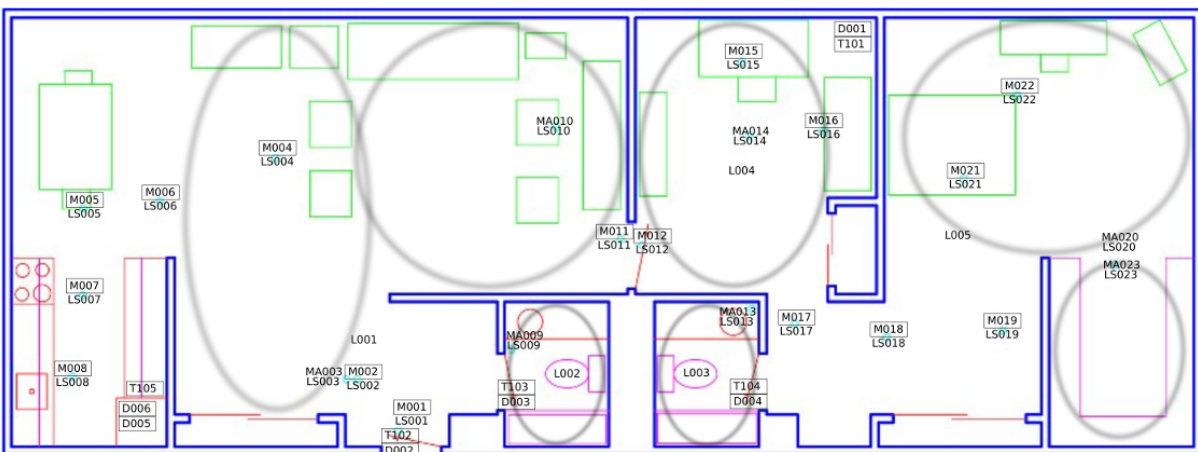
Floor plan and sensor placement for the testbed hh102.
